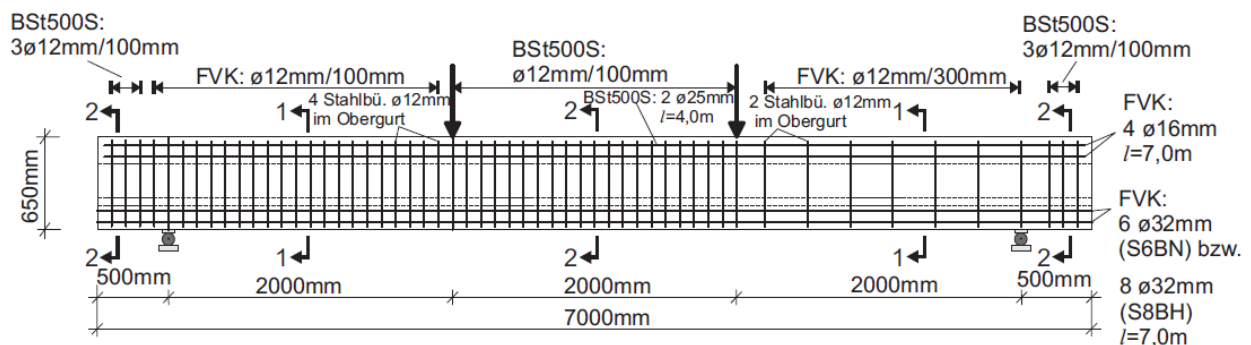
Plan of reinforcement for test beam: S6BN-0.8-11(Kurth 2012)
